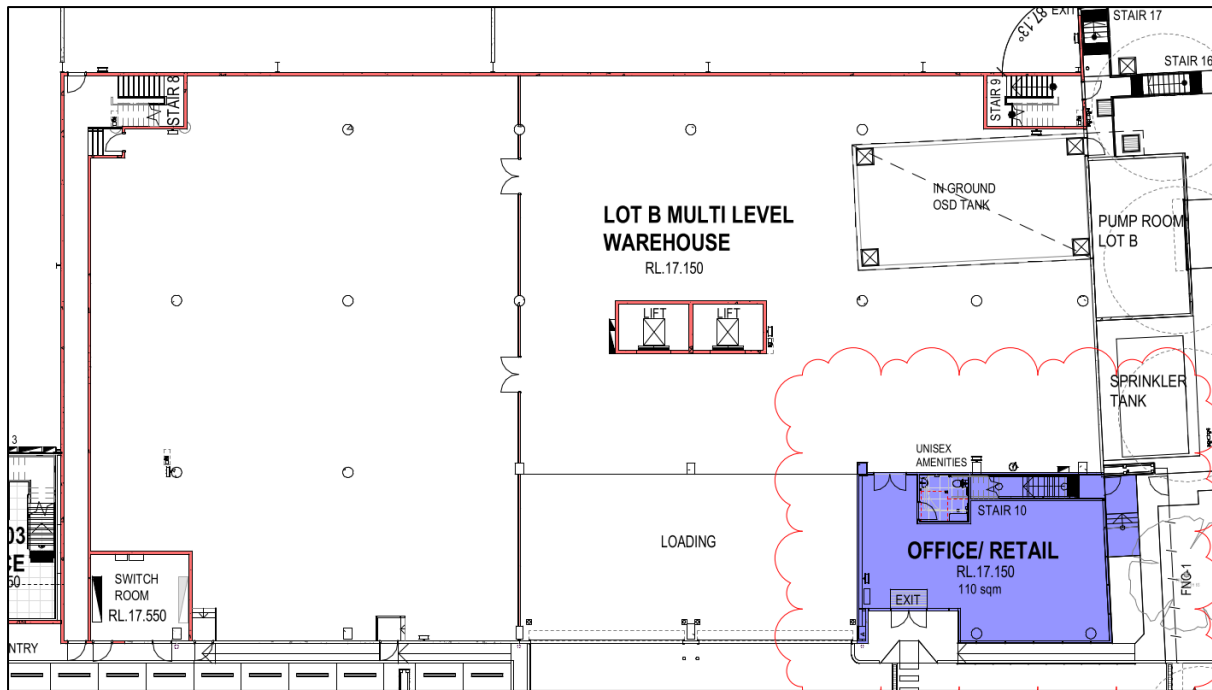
Extract of the proposed ground floor alterations and addition – Lot B Building 1.
